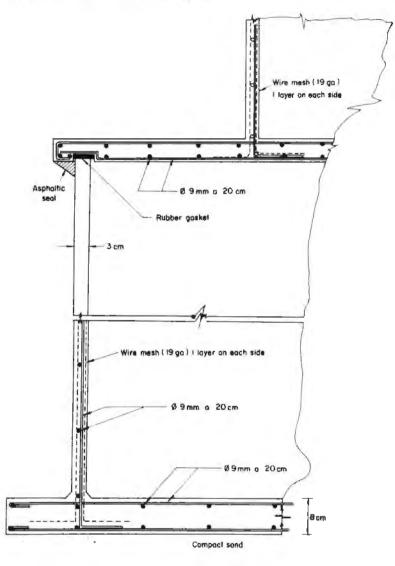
Structural details of the ferrocement biogas cylinder and the water pressure tank.
